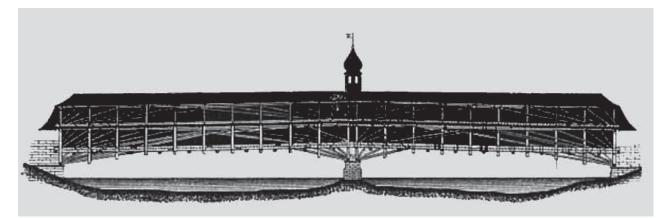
Elevation of Schaffhausen Brücke, finished in year 1758 (SETRA (2006a))
